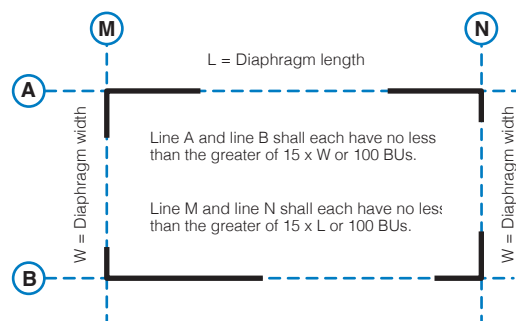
GIB® CEILING DIAPHRAGM SHEET WIDTHS AND LENGTHS
